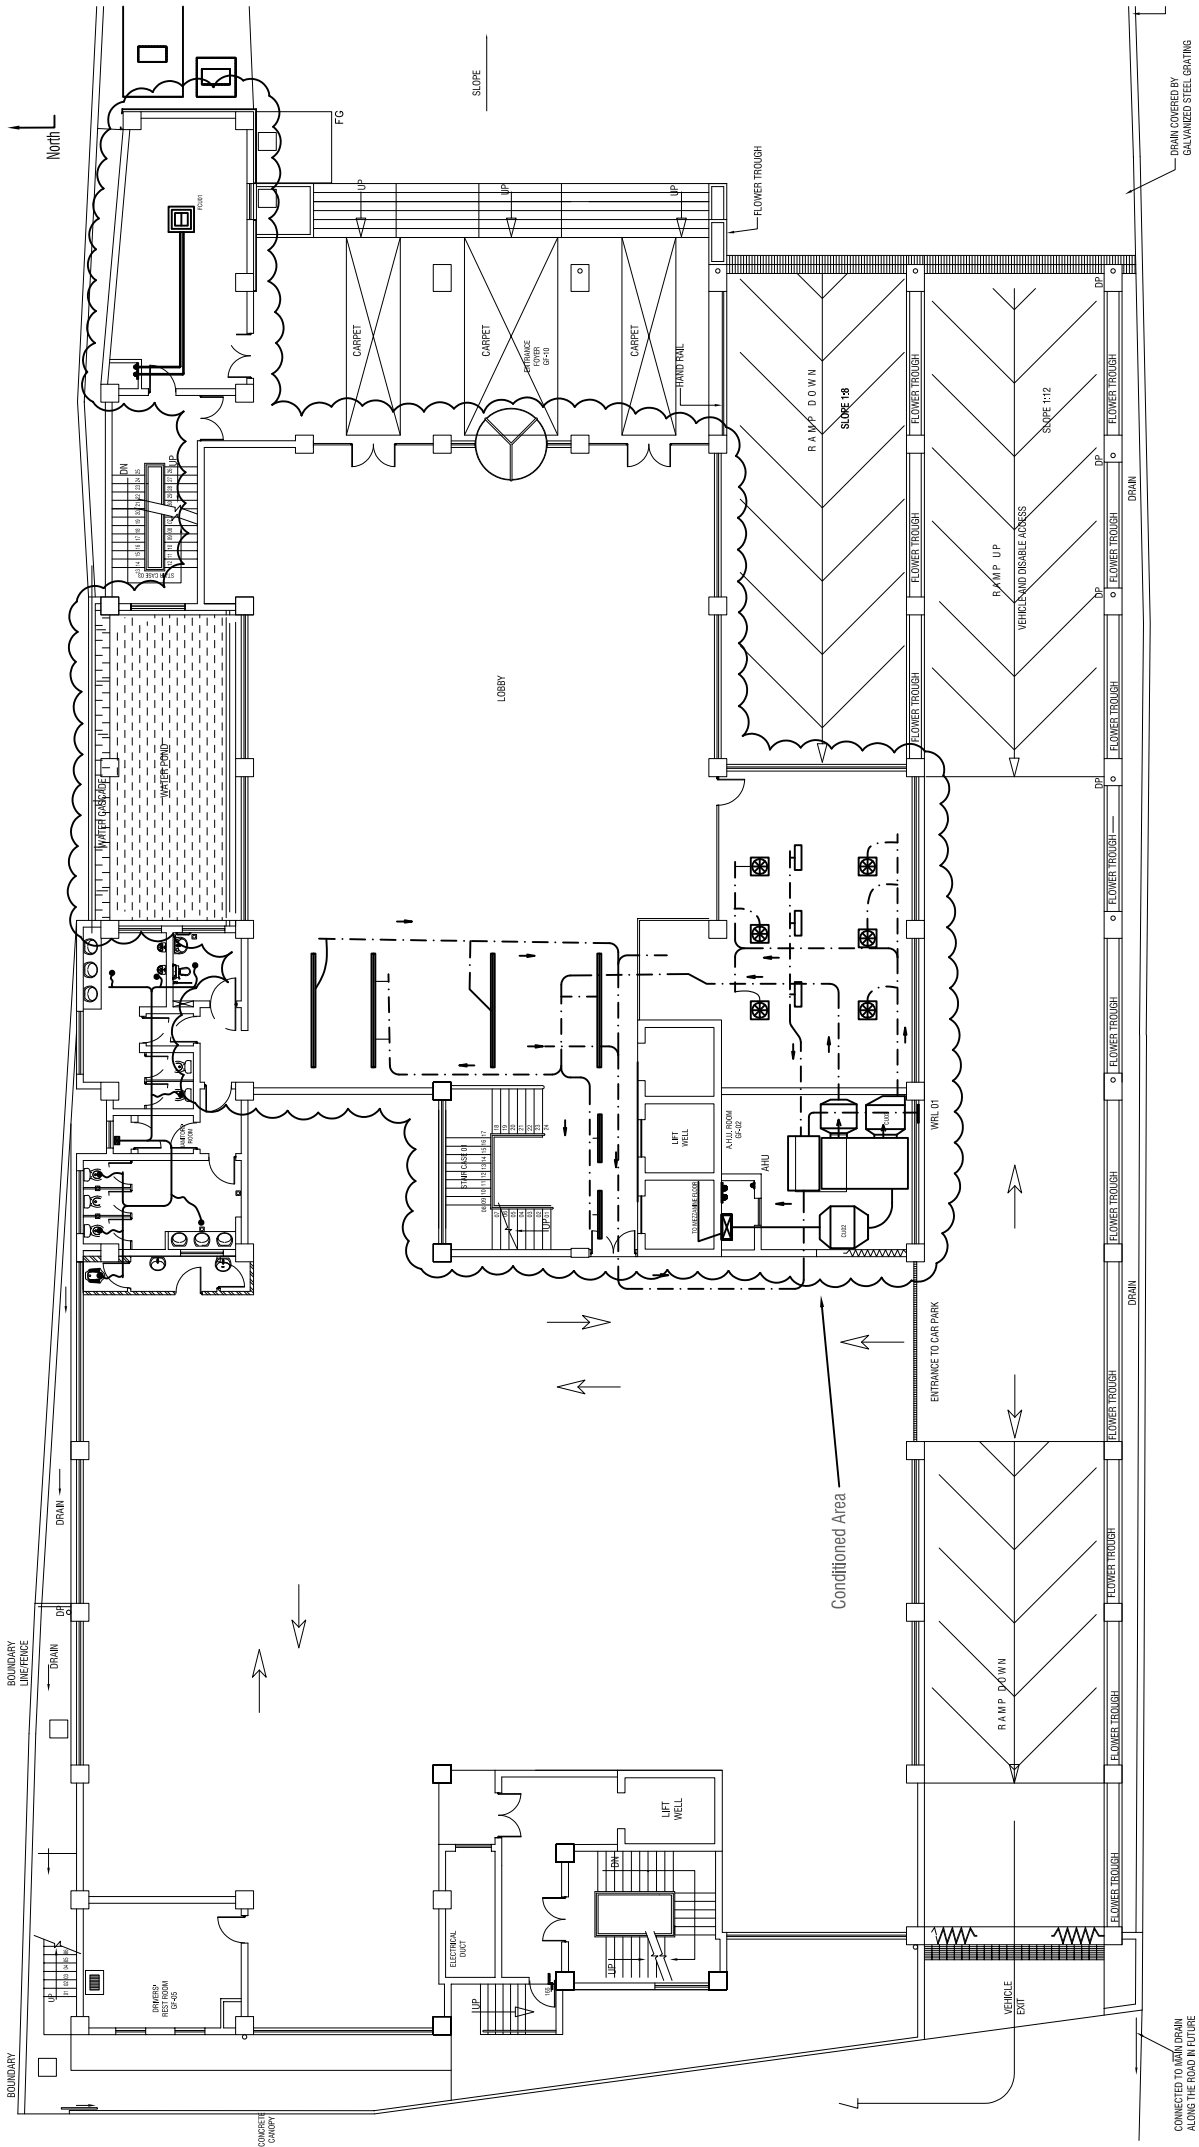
Ceylon Petroleum Corporation Head Office Building - Ground Floor
